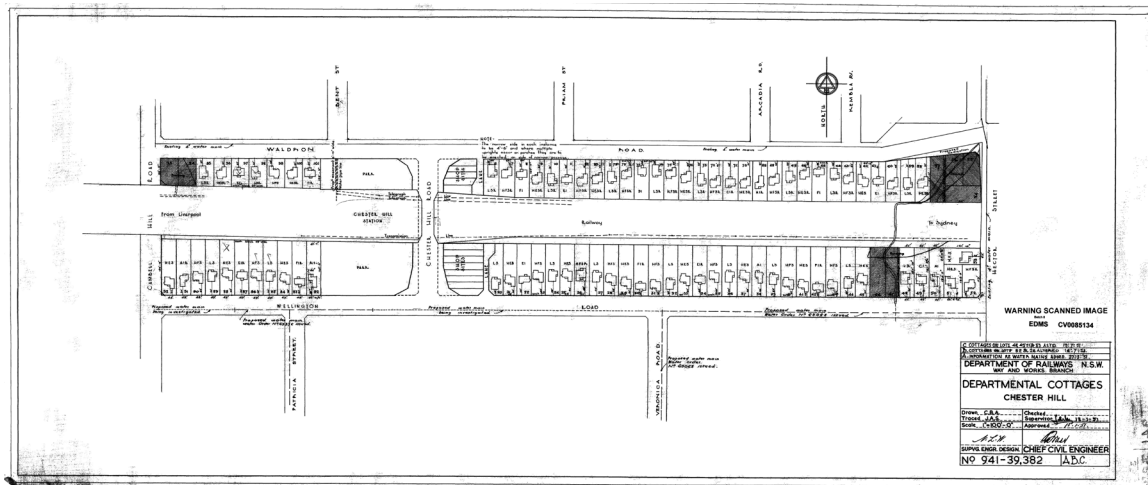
Departmental Cottages Chester Hill, c.1953 (Virtual Plan Room).
